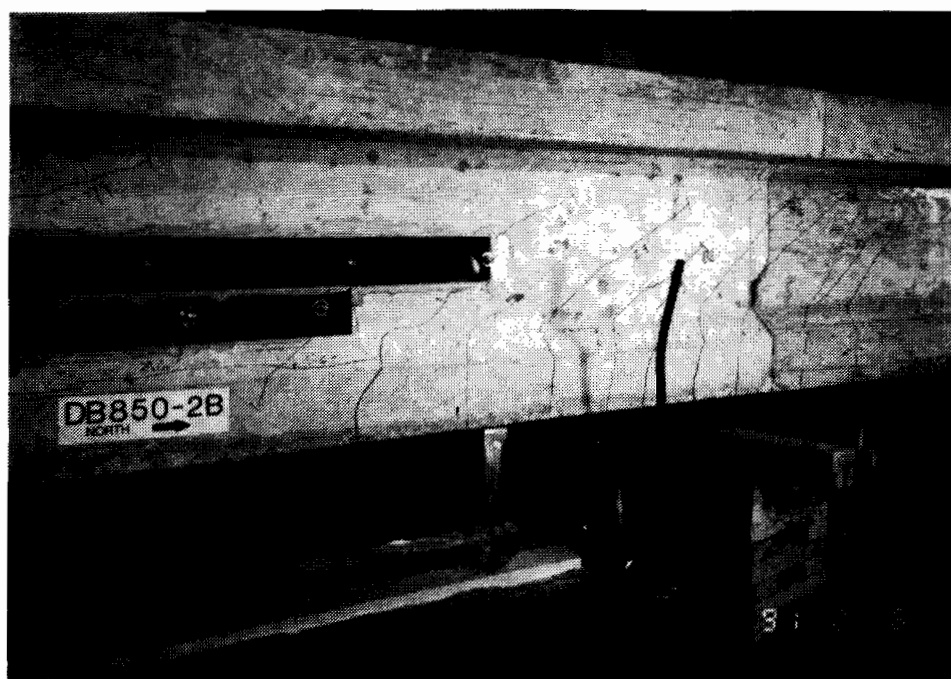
Bursting Crack Developed During Test DB850-2B (S)
